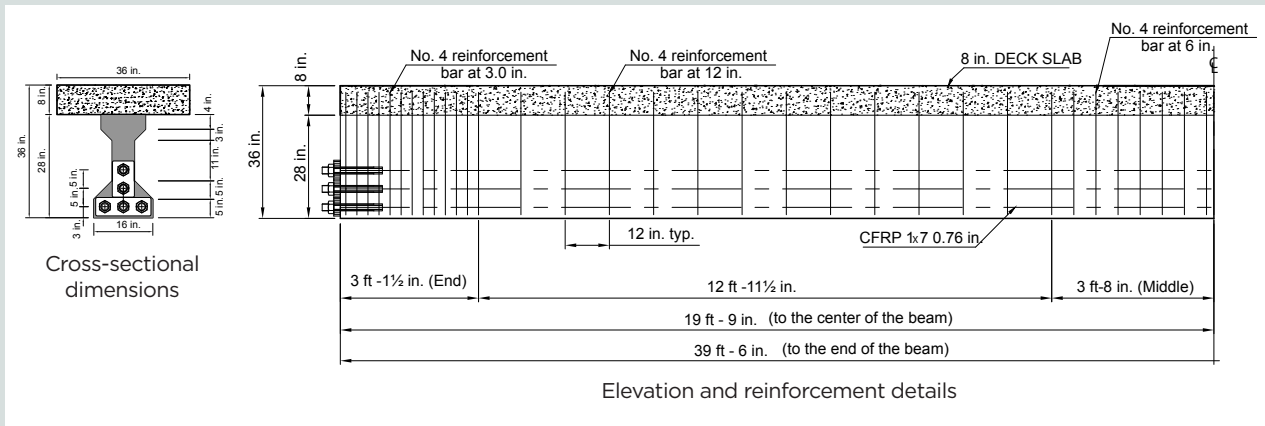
Typical details for full-scale post-tensioned concrete beams with straight cables. Note: CFRP = carbon-fiber-reinforced polymer. No. 4 = 13M. 1 in. = 25.4 mm; 1 ft = 0.305 m.
